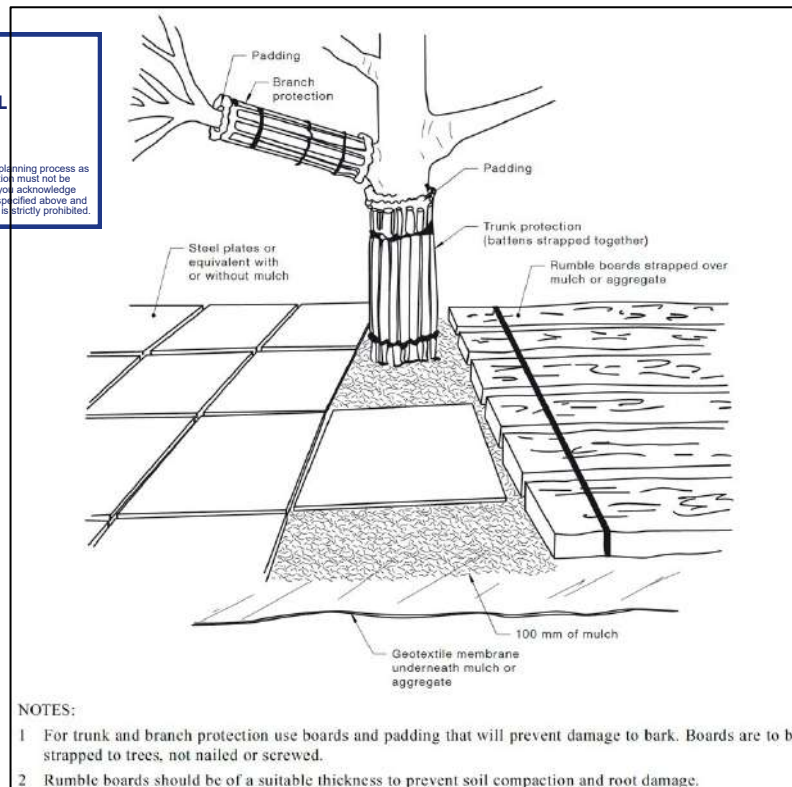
Ground, Trunk & Branch protection as per AS 4970 - 2009
